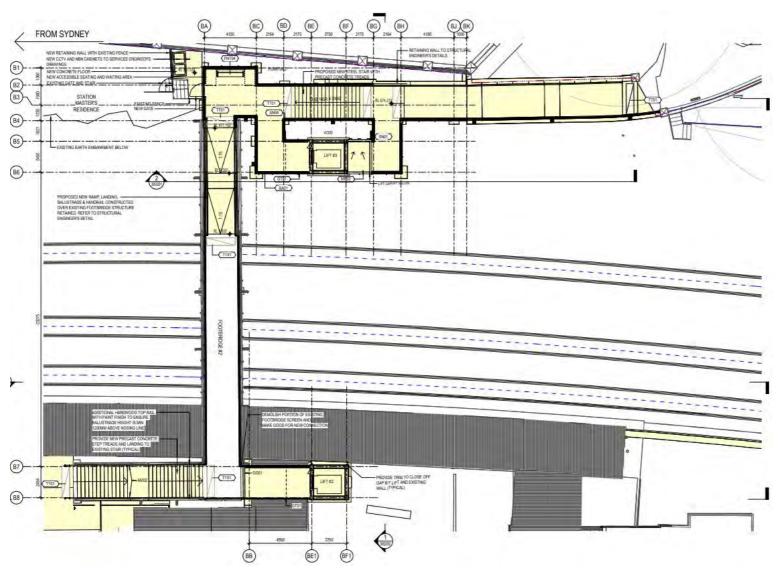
Station and Argyle Street - footbridge level plan (Architectus, drawings dated 19/1/2024)
